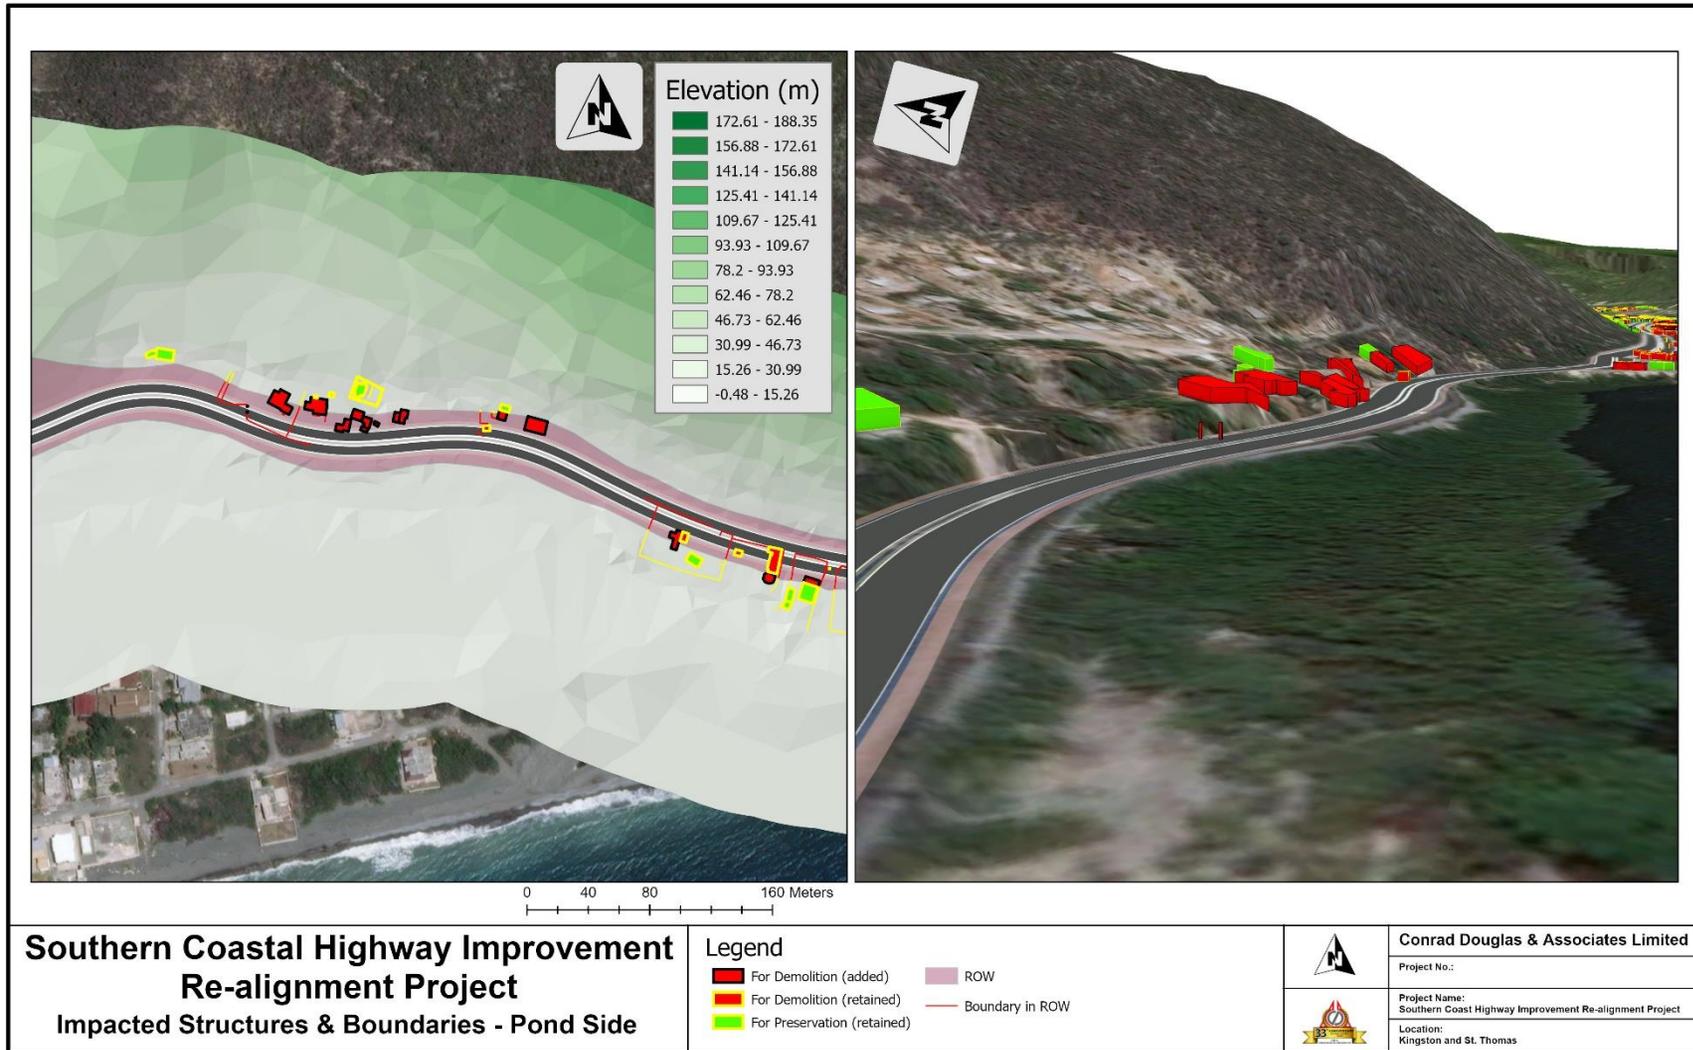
Detail of Alignment Adjustment on Structures in the Pond Side Area of Bull Bay
